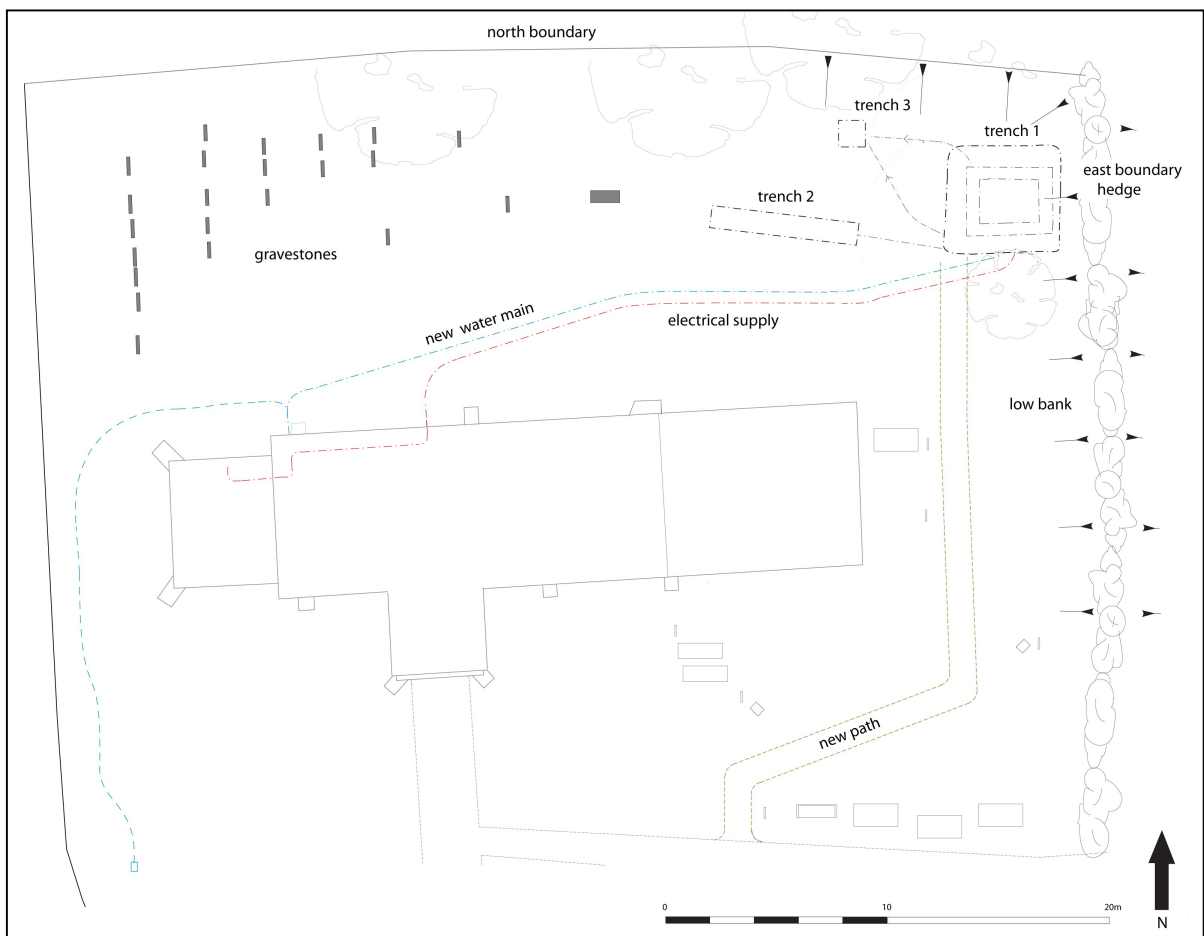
Plan of St John the Baptist Church and churchyard showing area of excavation.
